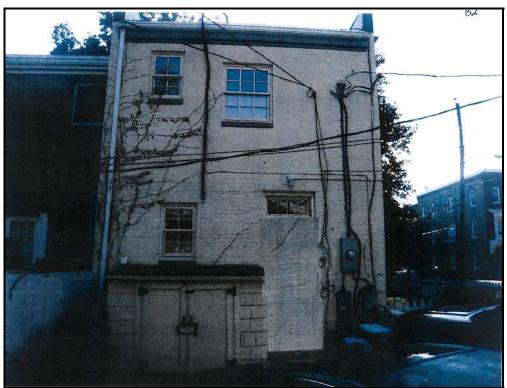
Proposal – Rear Elevation (Door Removal/Brick Enclosure)
